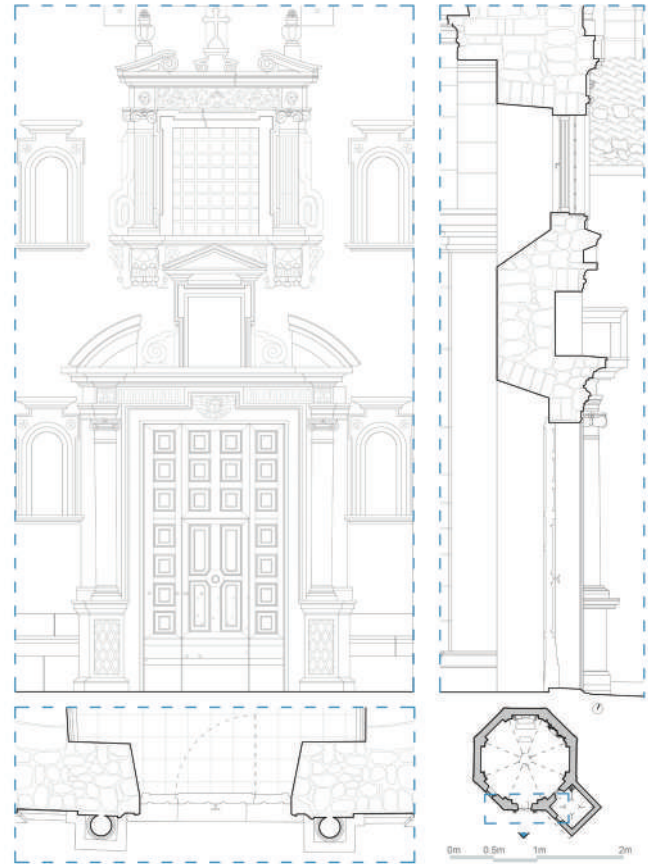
Detail in elevation, horizontal and vertical sections of the main facade. Drawing by Luca Cetra.
